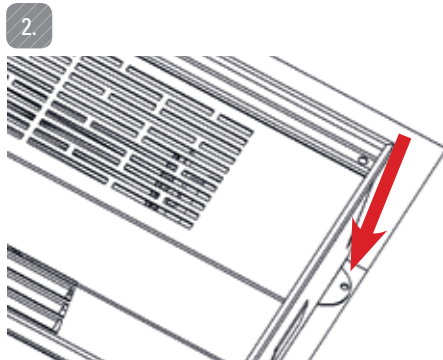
Place the convector in the structural opening, mark the holes for mounting the feet, and remove the convector.
